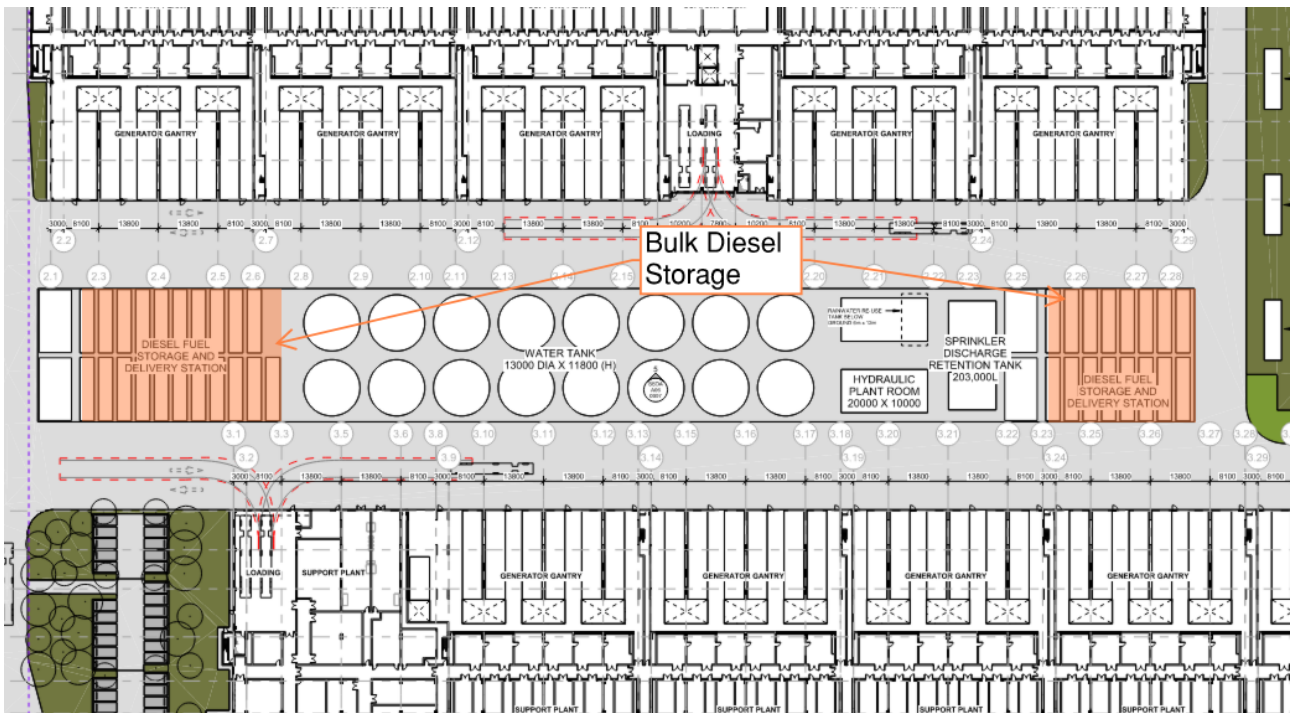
Location of Bulk Storage tanks – on Ground Floor between Building 1 and 2
